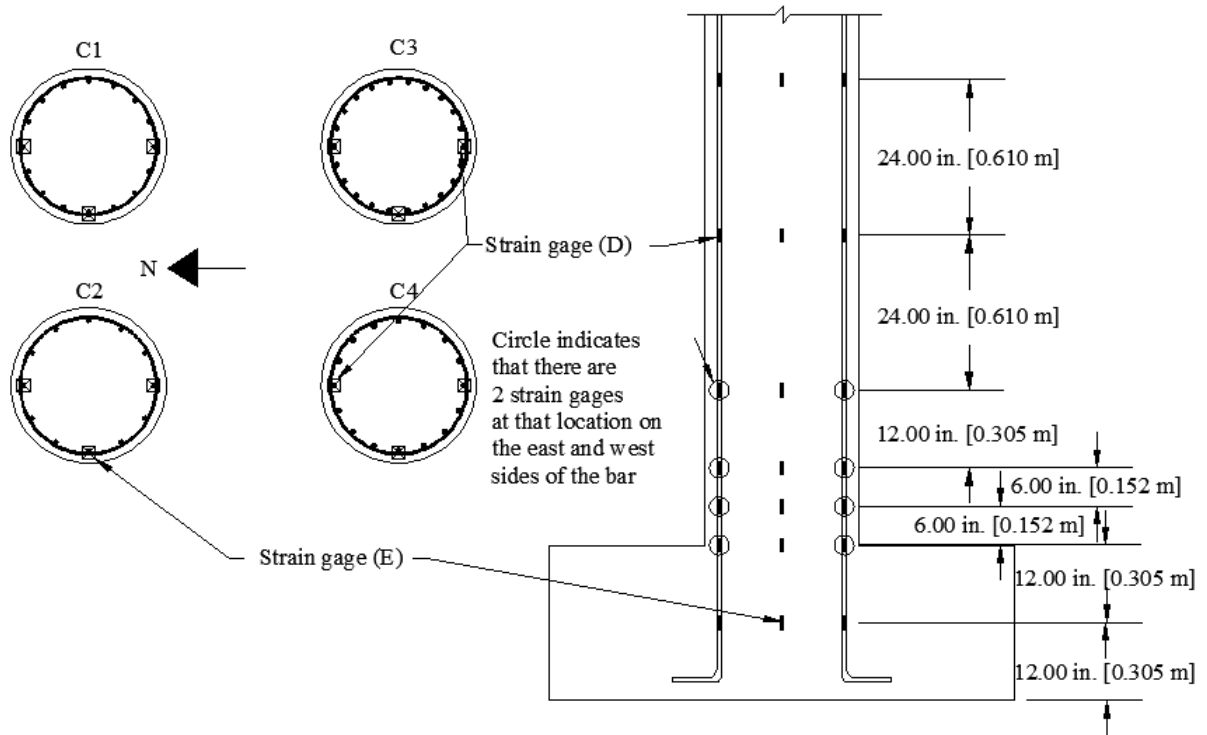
Column C1, C2, C3, and C4 internal instrumentation
